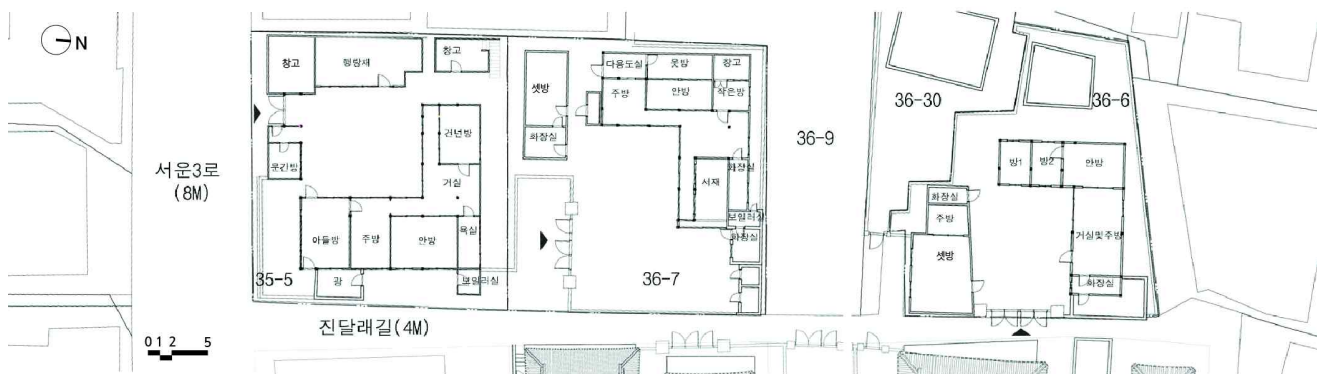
First floor plans of existing 35-5, 36-6, and 36-7 Han-ok houses in Seoun-dong
